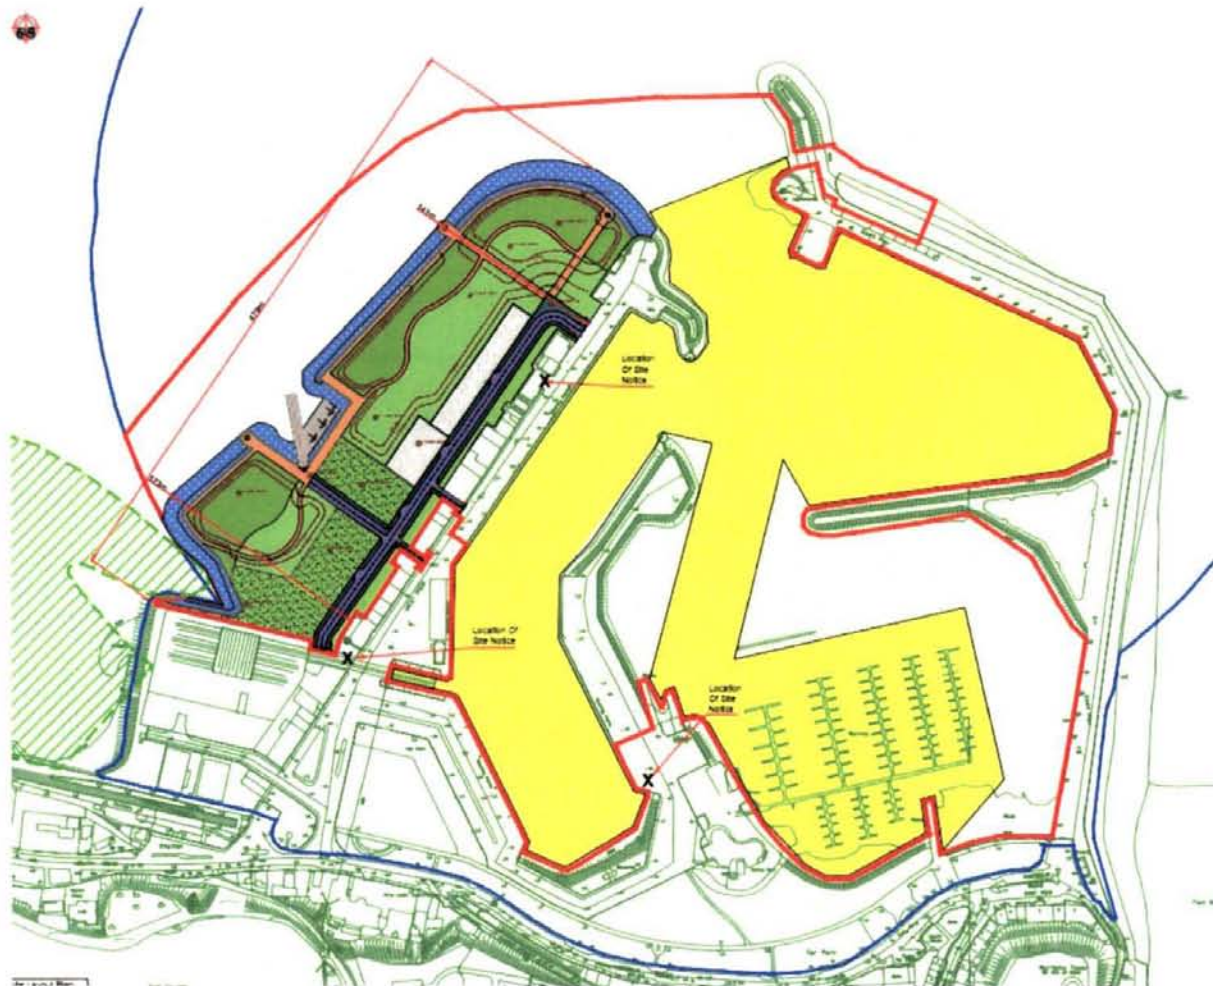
Extract of site layout drawing showing the proposed reclamation area west of the West Pier and the dredge area in yellow (Drawing no. 19934-5002 Site Layout Plan, Appendix 13 Volume 3 of this EIAR).
